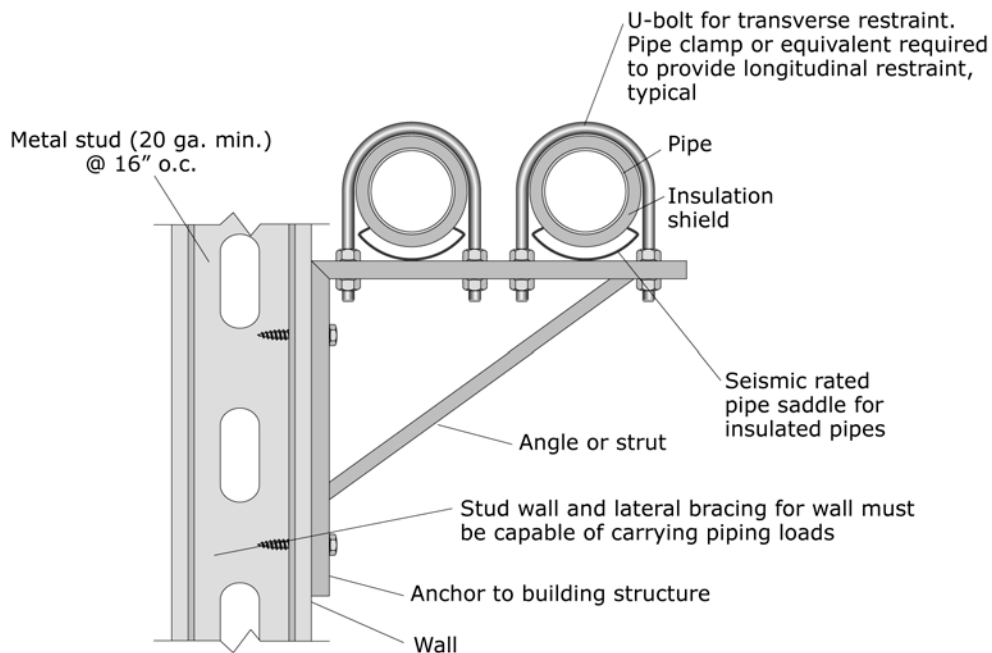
Wall-mount to stud wall with pre-manufactured brackets (ER).
